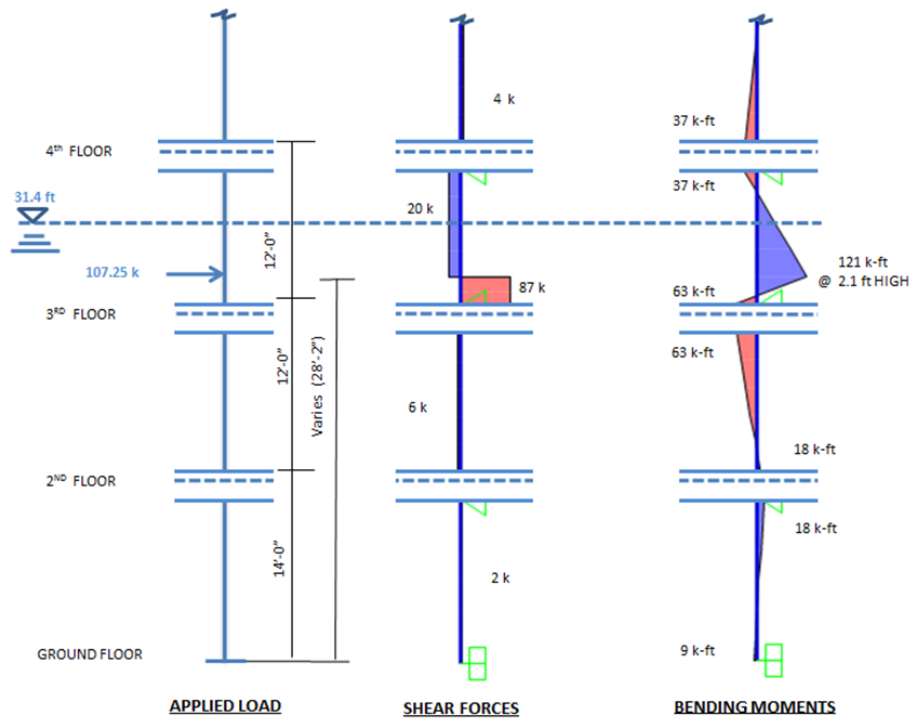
Impact load applied at "d" away from the end of column on the 3rd floor
